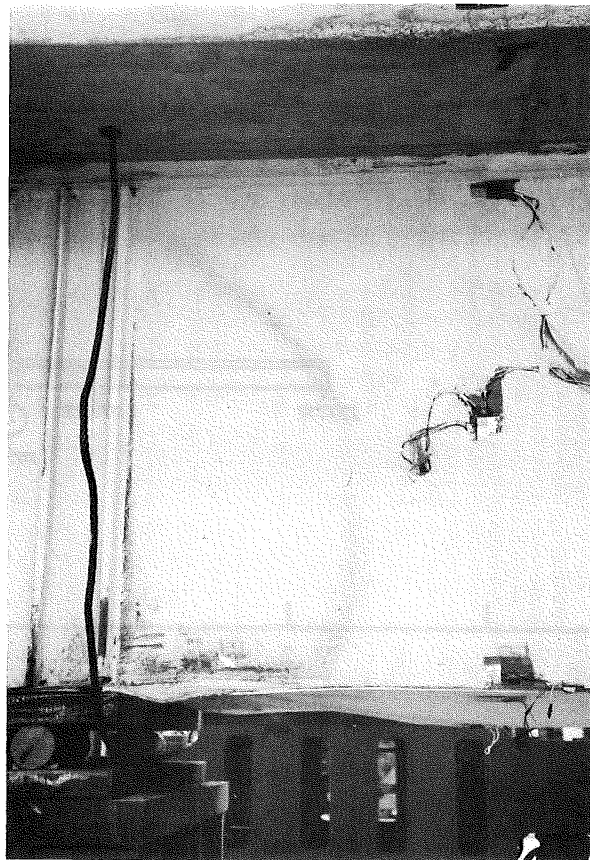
Failure at Bottom Flange and South Web, L2-CD
